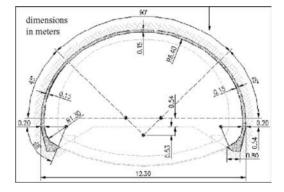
Cross section of a typical two lane, full face tunnel, lines B and H.
